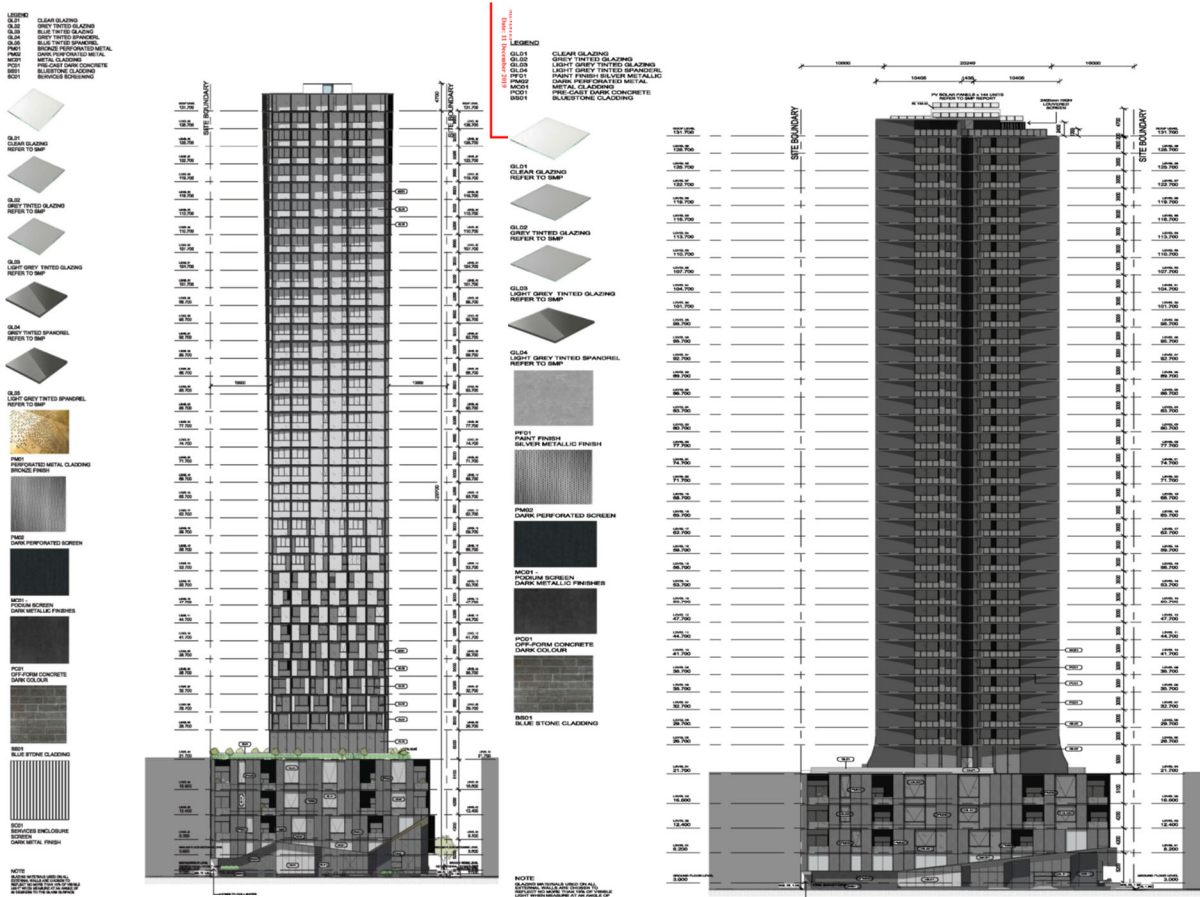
Approved Elevation to Normanby Road (left) v’s Proposed Elevation to Normanby Road (right). Please refer to pages 40 and 41 of Appendix C: Proposed Amended Plans for photomontages.
